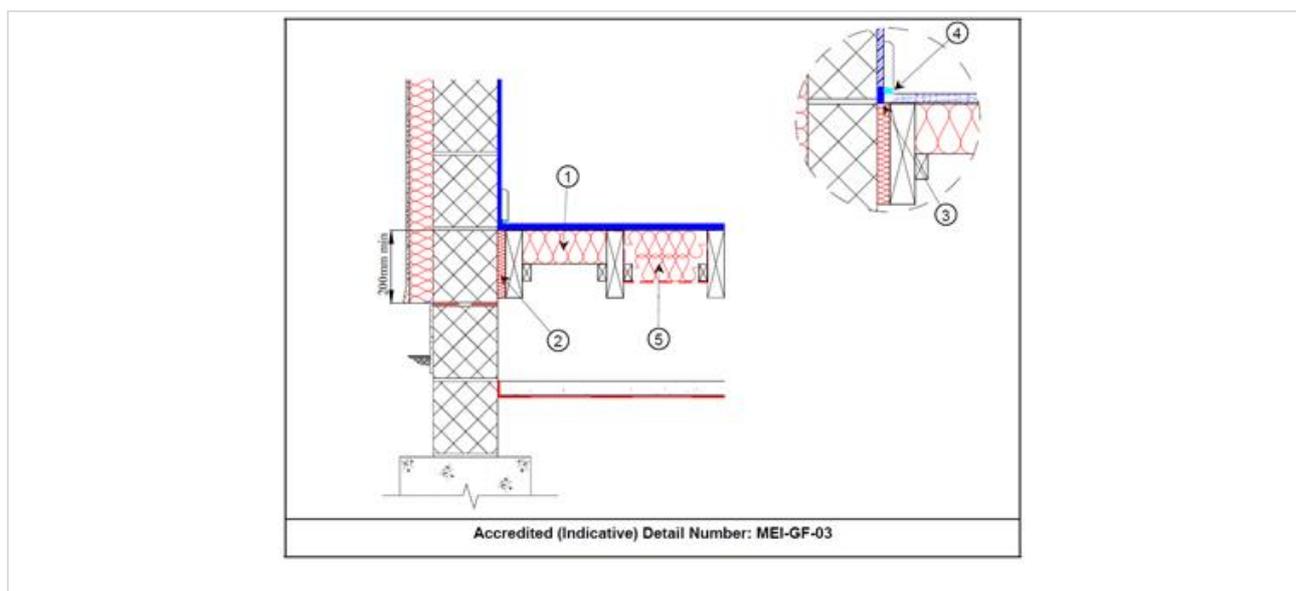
ACD for Timber Suspended Ground Floor. Extracted from ACDs for Masonry External Wall insulation.
